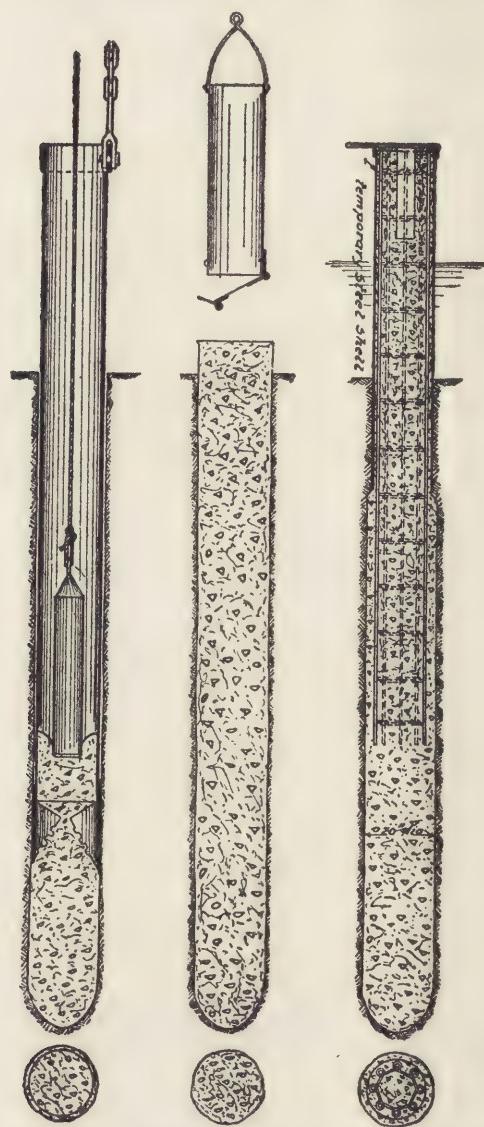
One Form of Concrete Piles Showing Method of Placing Concrete and Reinforcement.
